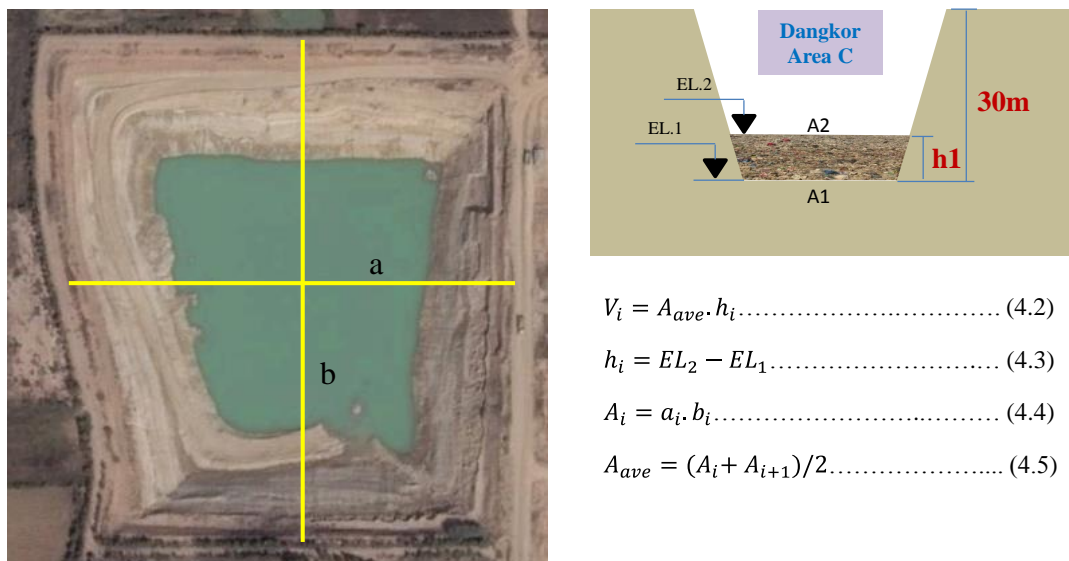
Top plan and cross-section of area C for deep pit disposal of waste height and volume calculation
